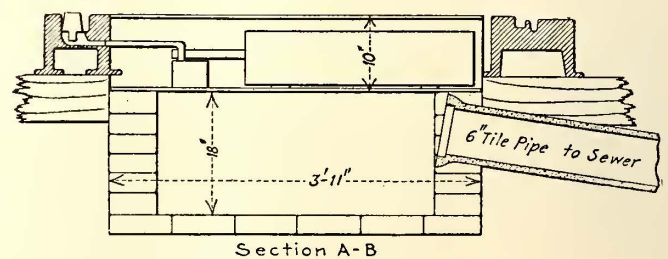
TRACK SWITCH INSTALLATION SHOWING PROVISION FOR DRAINAGE
